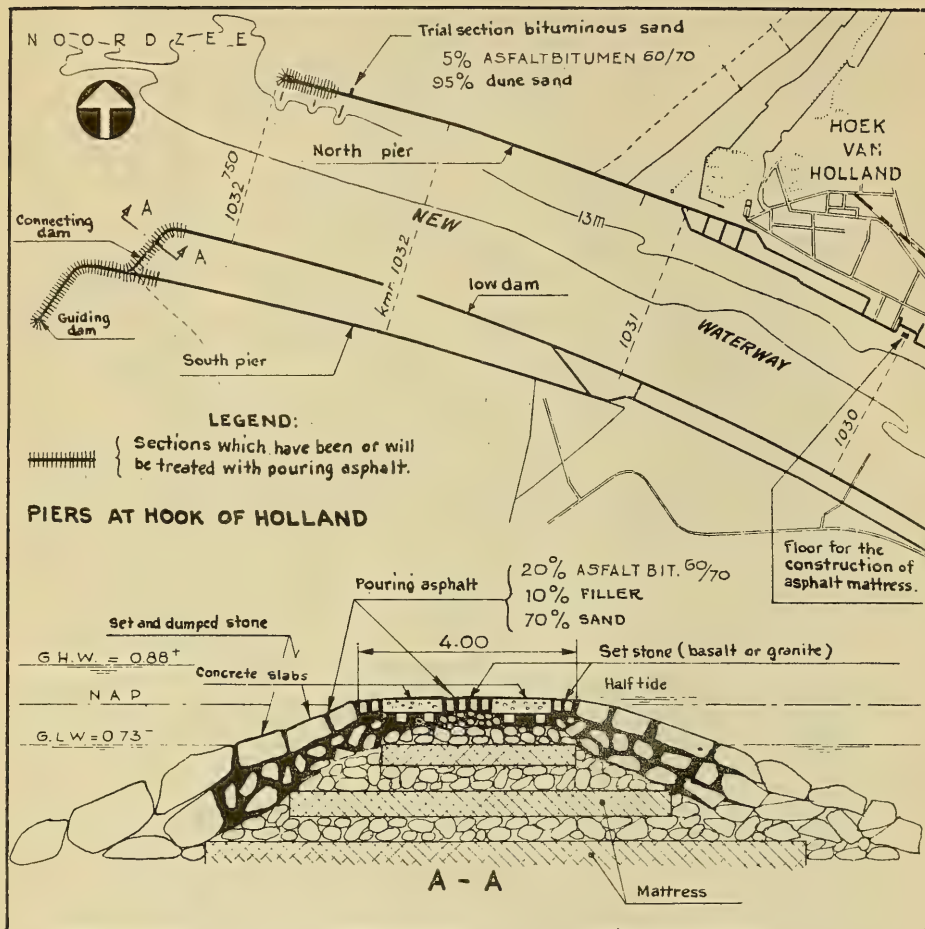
Reinforcement of the offshore sections of the piers at Hook of Holland.
